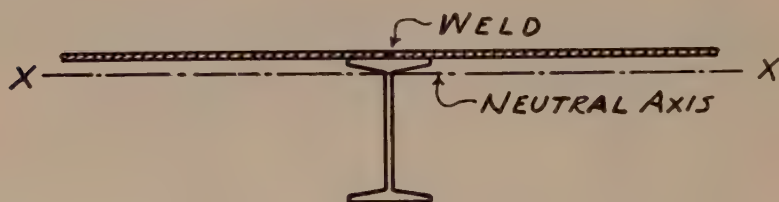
BATTLEDECK FLOOR CONSTRUCTION
